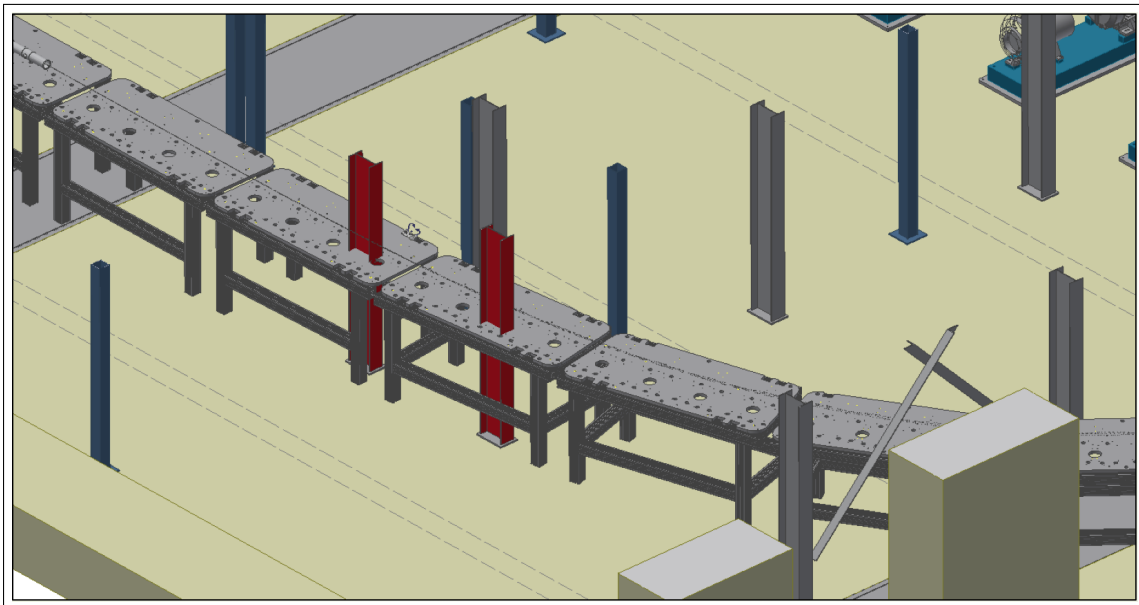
Area for the FFA arc girder installation. Few support poles need to be repositioned.
